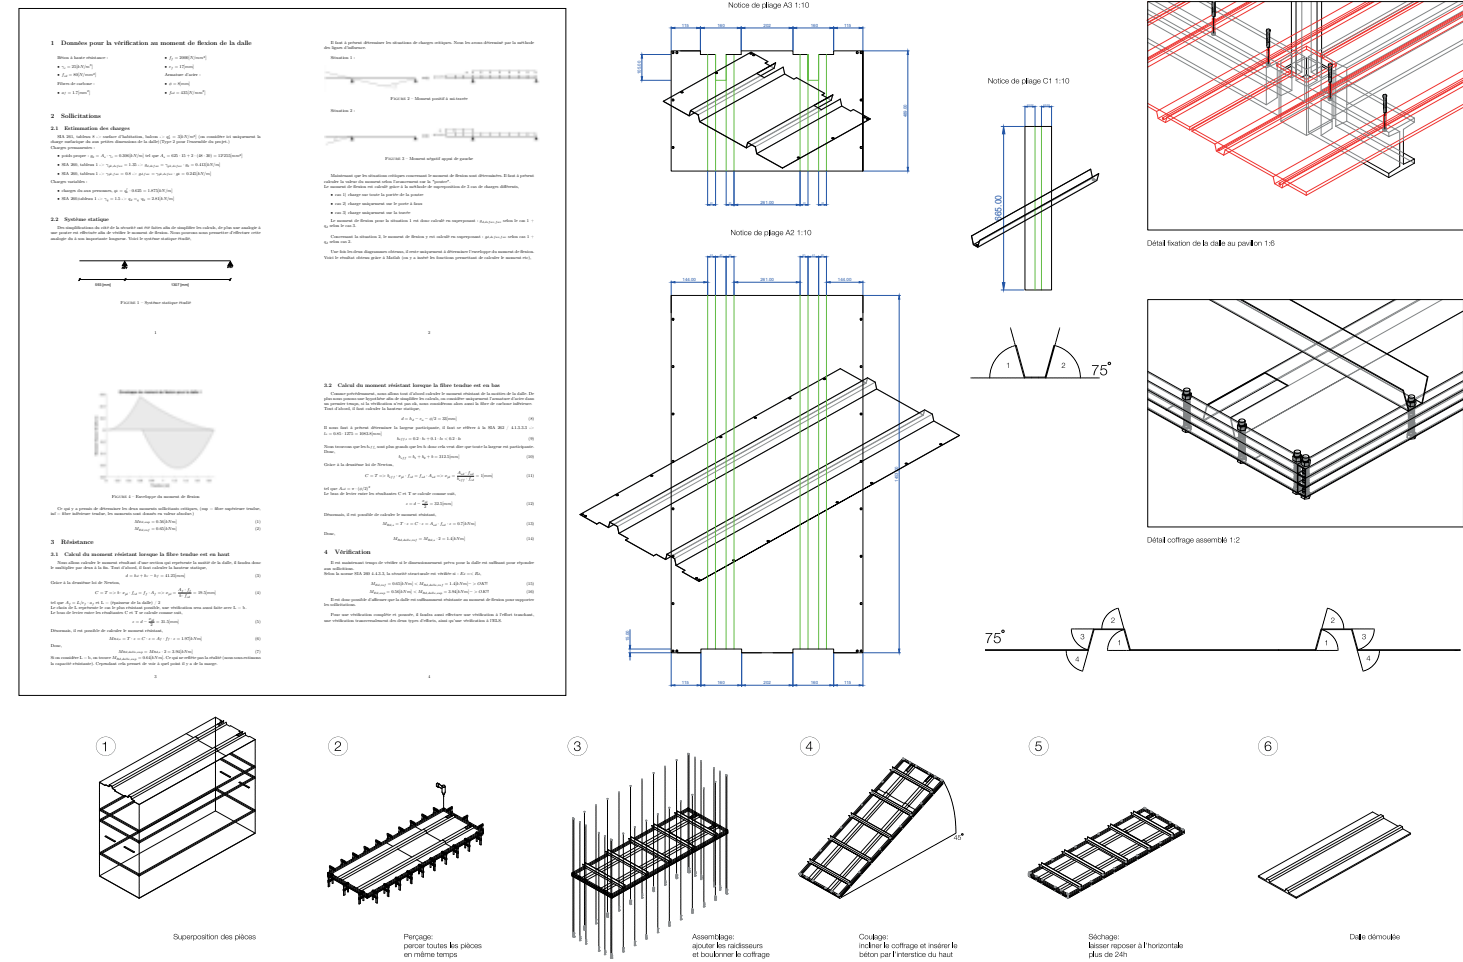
Drawing of mold of new slab prototype, 2021
